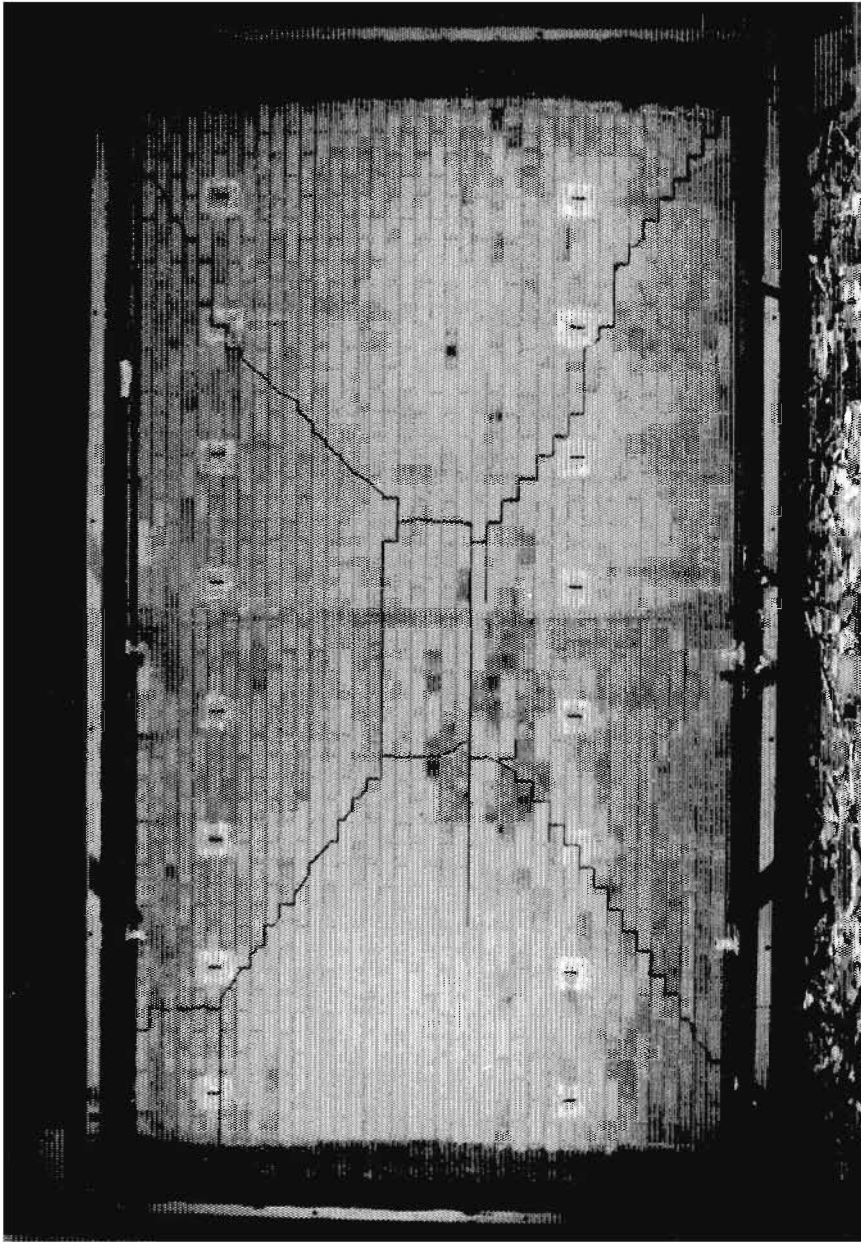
CRACK PATTERN AT FAILURE – WALL3
